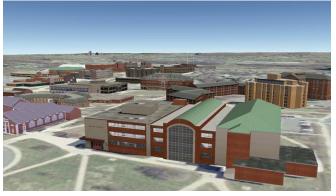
Willard Hall and DiLoreto Hall Renovation Rendering
